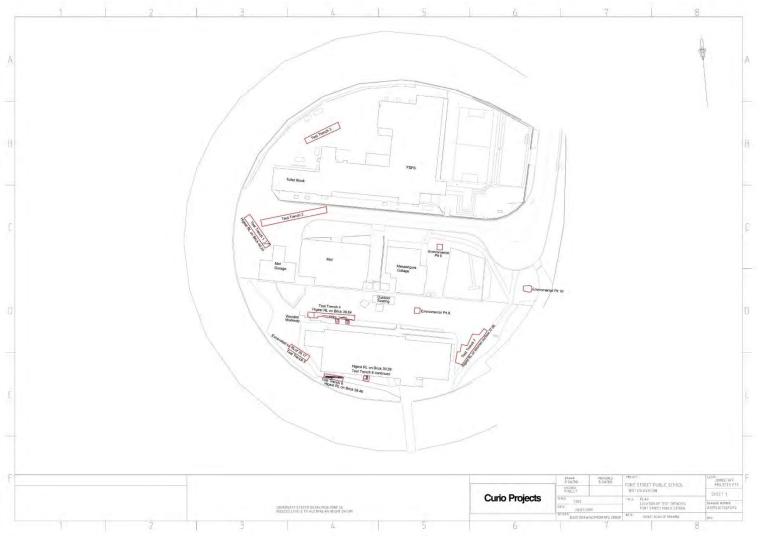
Location of test trenches at Fort Street Public School (Source: Curio, 2019)
